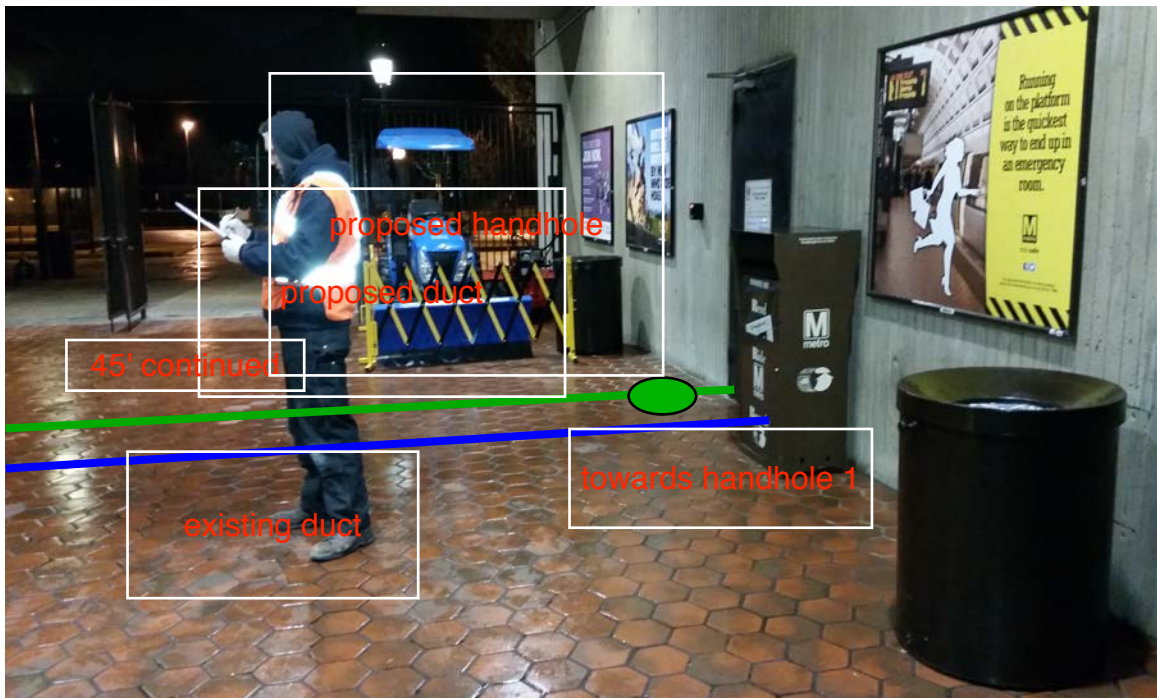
C12 Braddock Road: Existing duct run from kiosk towards existing handhole 1 and proposed conduit from proposed handhole on mezzanine floor towards AFC panel.
